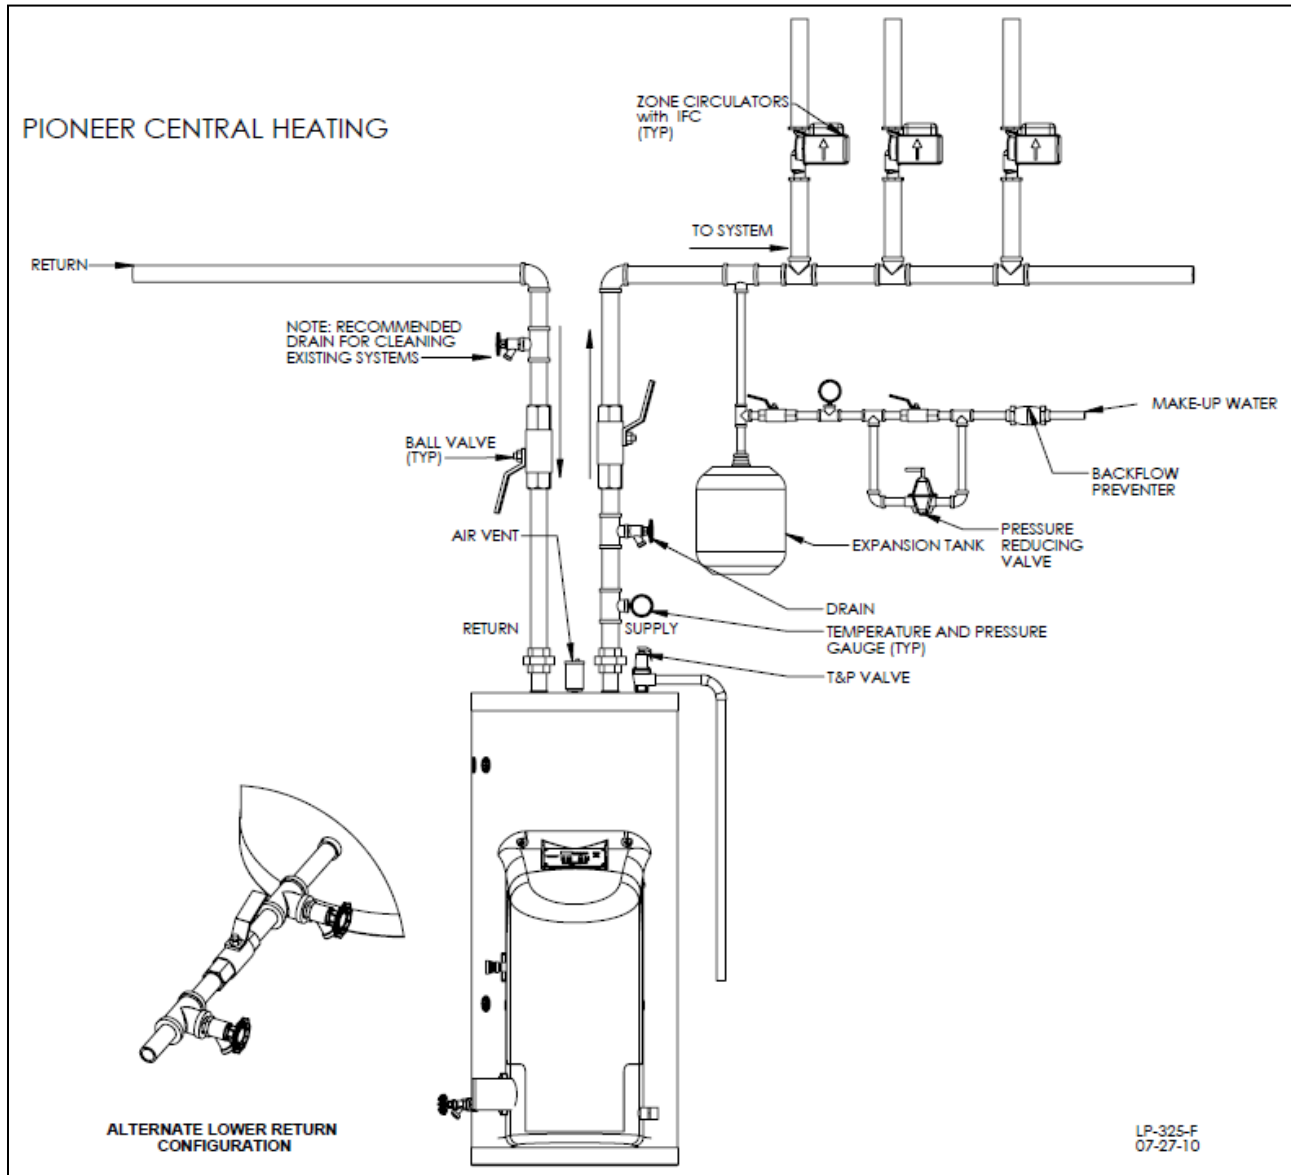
Central Heating Detail – LP-325-F NOTES:
